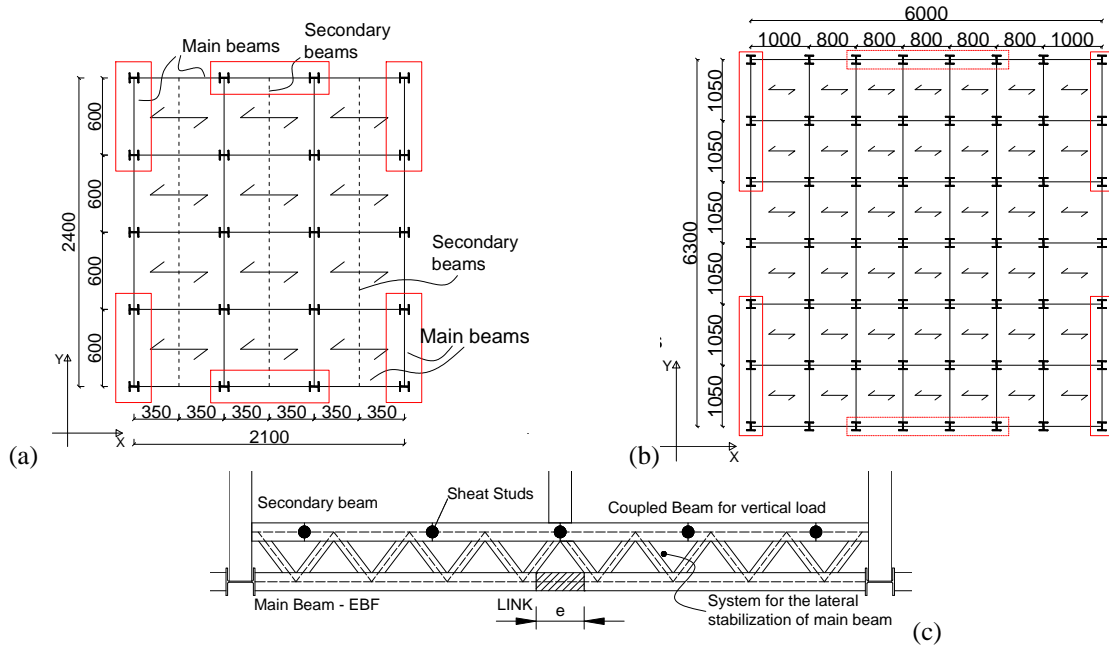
General plan of buildings a) office buildings 3 -4, b) car park 16 and c) beam duplication for decoupling vertical and seismic loads.
